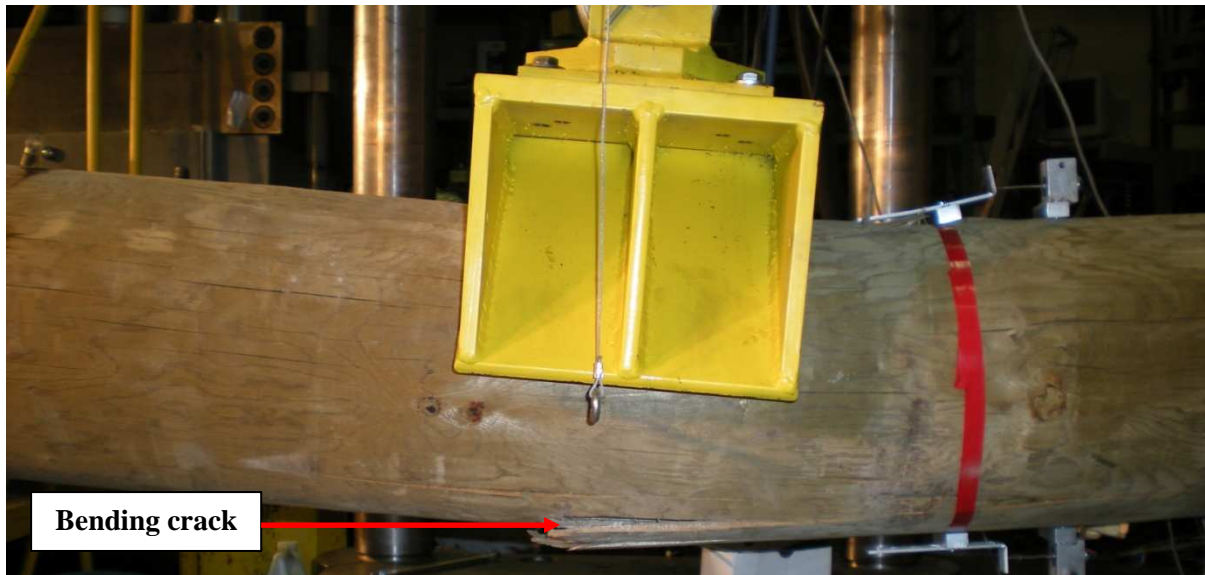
Typical new pole control specimen bending failure (60-2-2).
